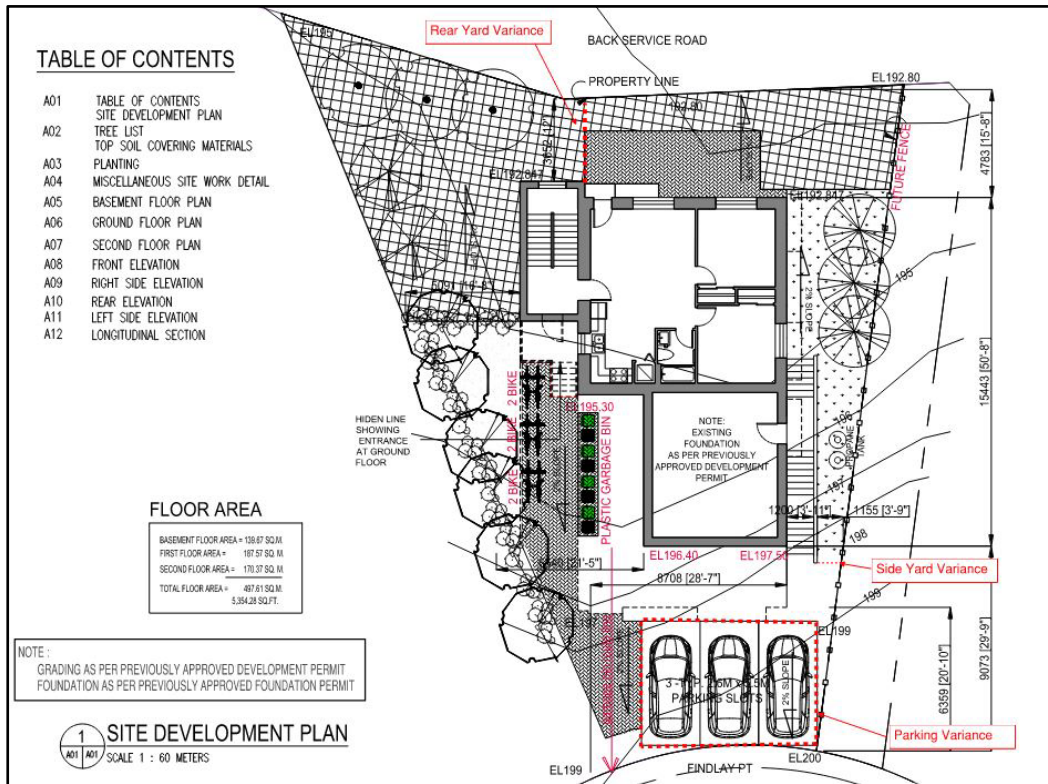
Site Plan Showing Rear Yard, Side Yard, and Parking Variances
